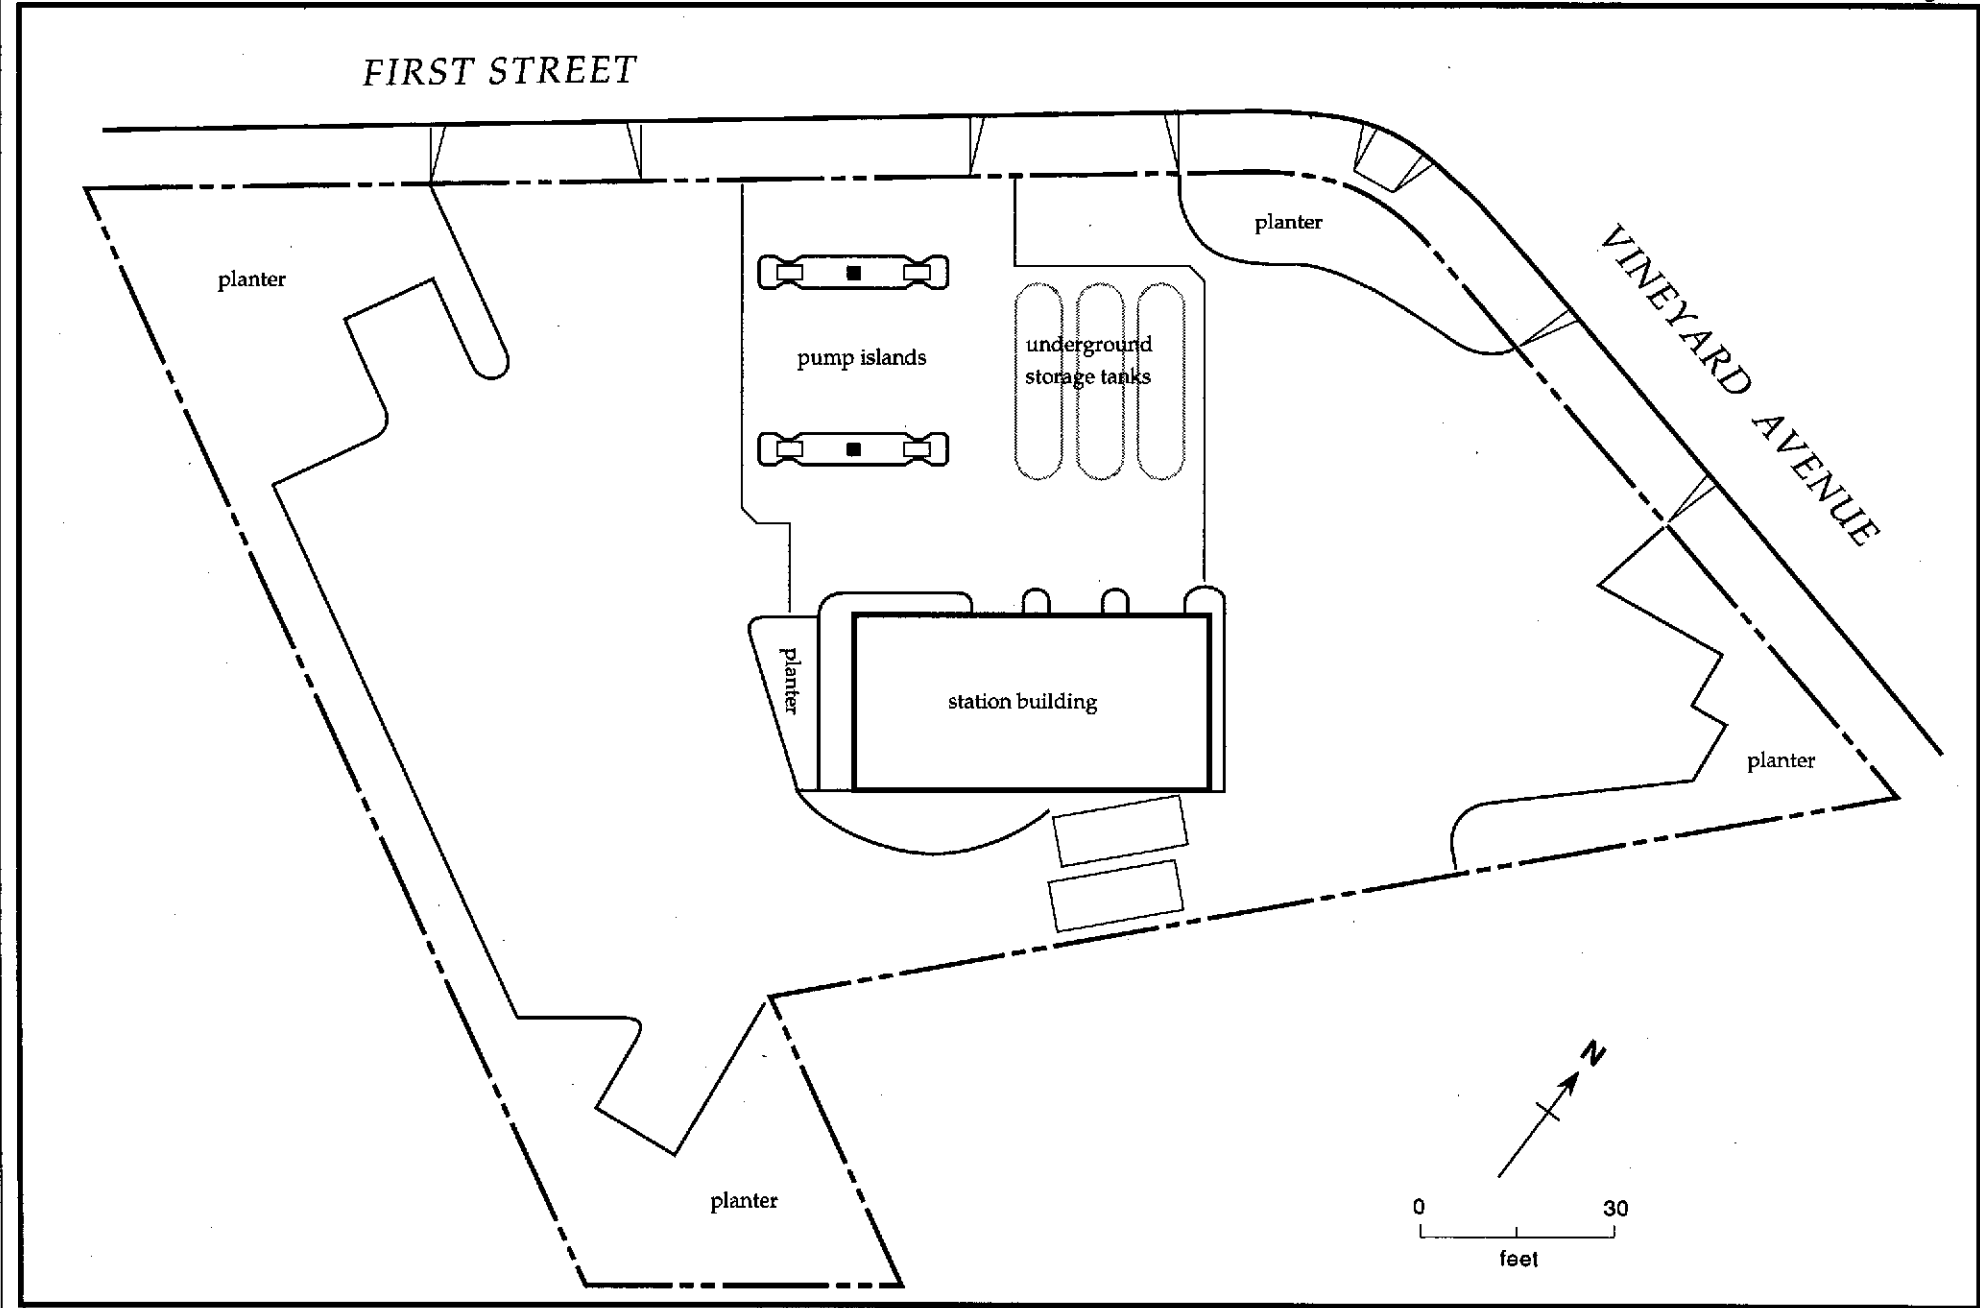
Site Layout - Shell Service Station WIC #204-6138-0303 - 4226 First Street, Pleasanton, California
